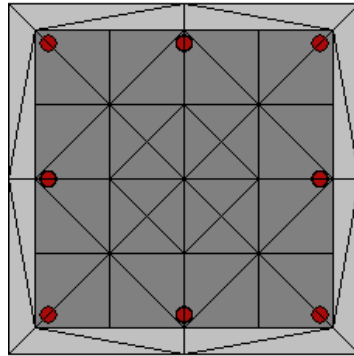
Column C 0.35x0.35 (8 No.16) fiber section for six story.
